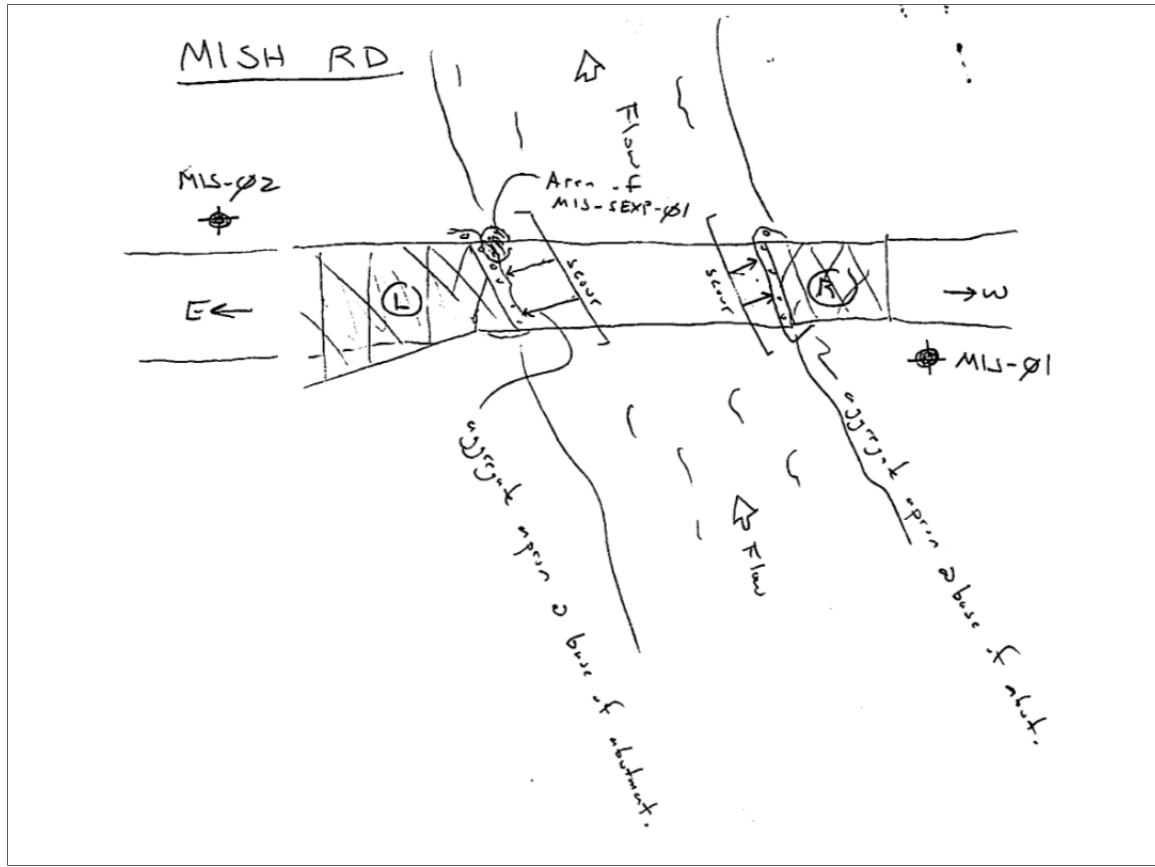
Field sketch of Bridge Fork Bridge, looking upstream.
